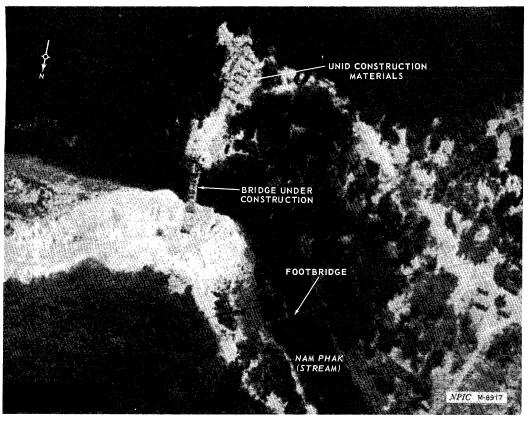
BRIDGE UNDER CONSTRUCTION OVER THE NAM PHAK NEAR MUONG LA, NORTHERN LAOS
